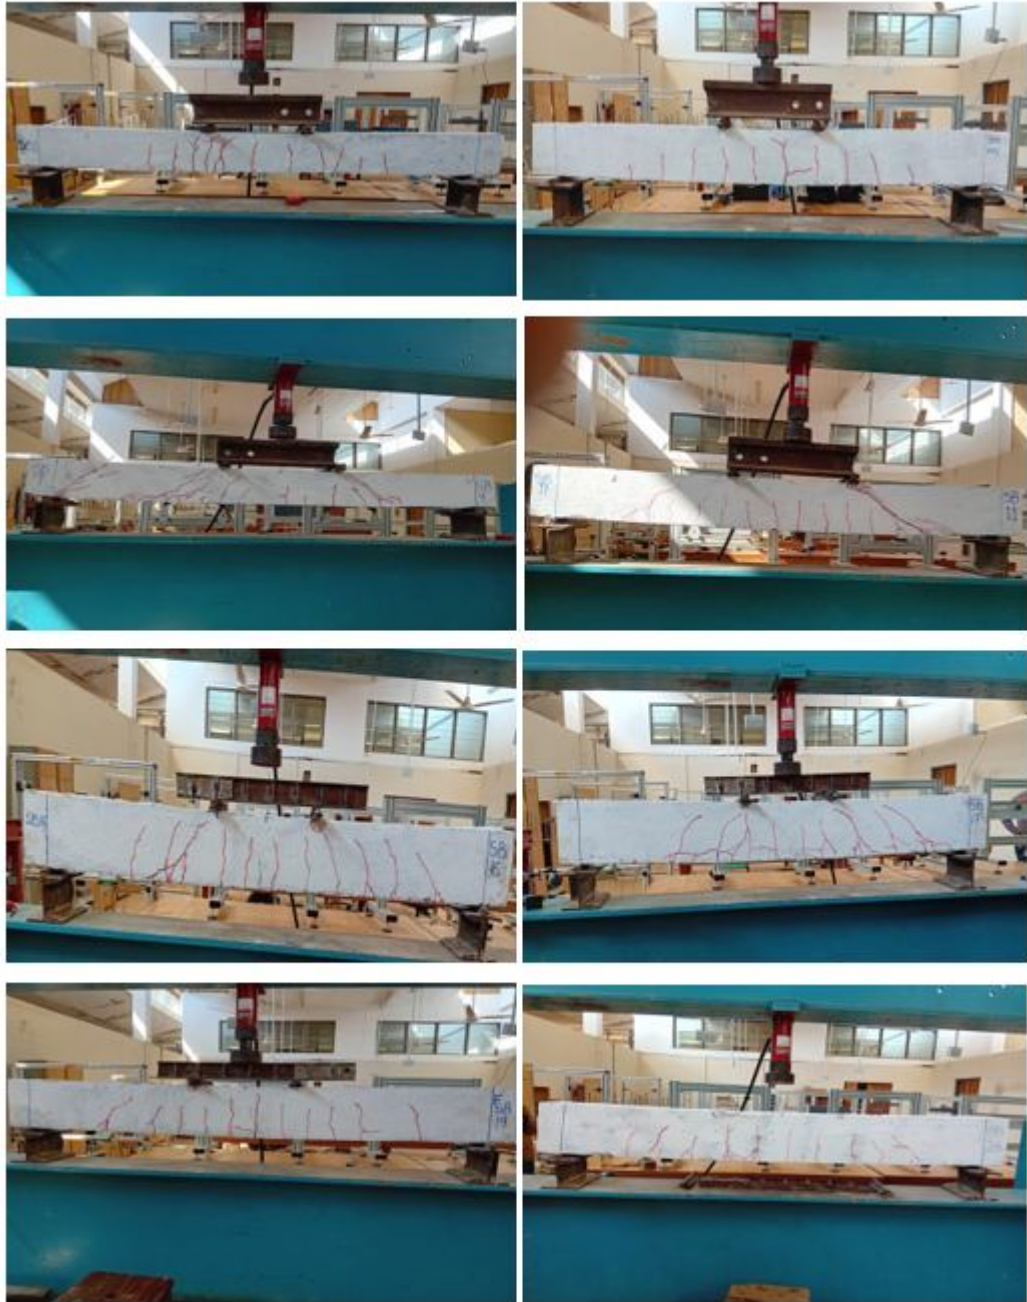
Crack pattern of fan palm reinforced concrete beam
